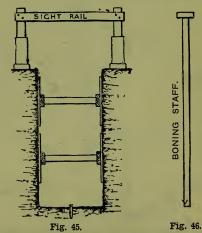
Cross Section of Trench with Sight Rail. Fig. 46.—Boning Staff.
